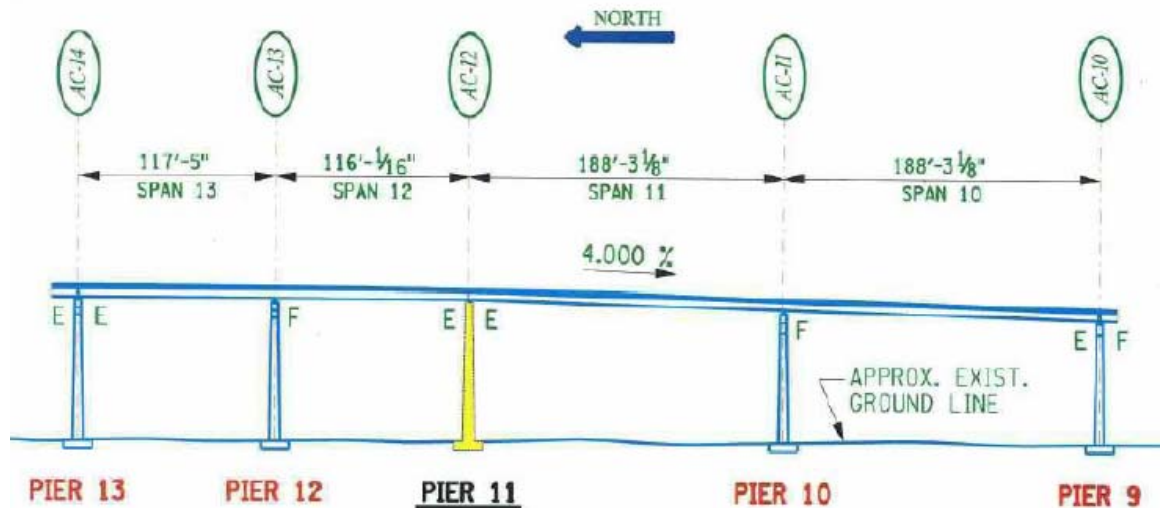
Bridge layout of the Dunn bridge, piers 9-13.
